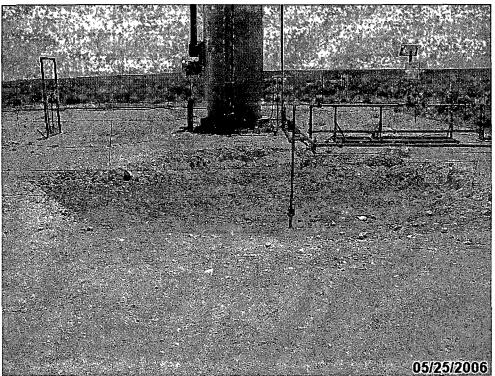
Looking southwesterly across excavation area two (2).
